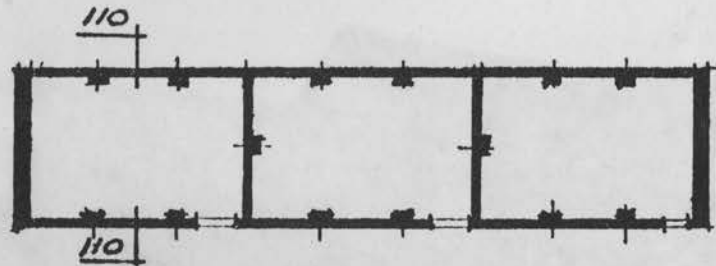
Classrooms with walls 110 mm thick, supporting pillars not strong enough to resist typhoons.
